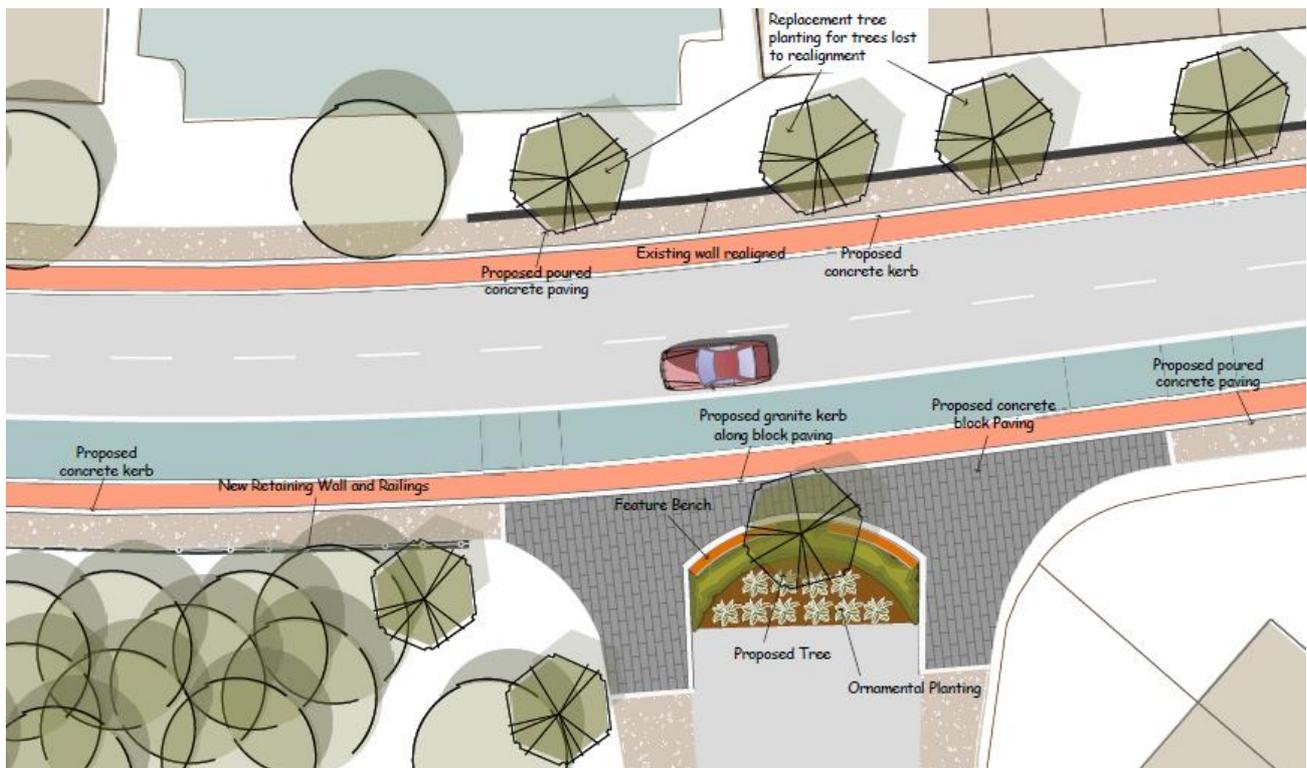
Road Closure at End of O'Hogan Road with Local Enhancement
